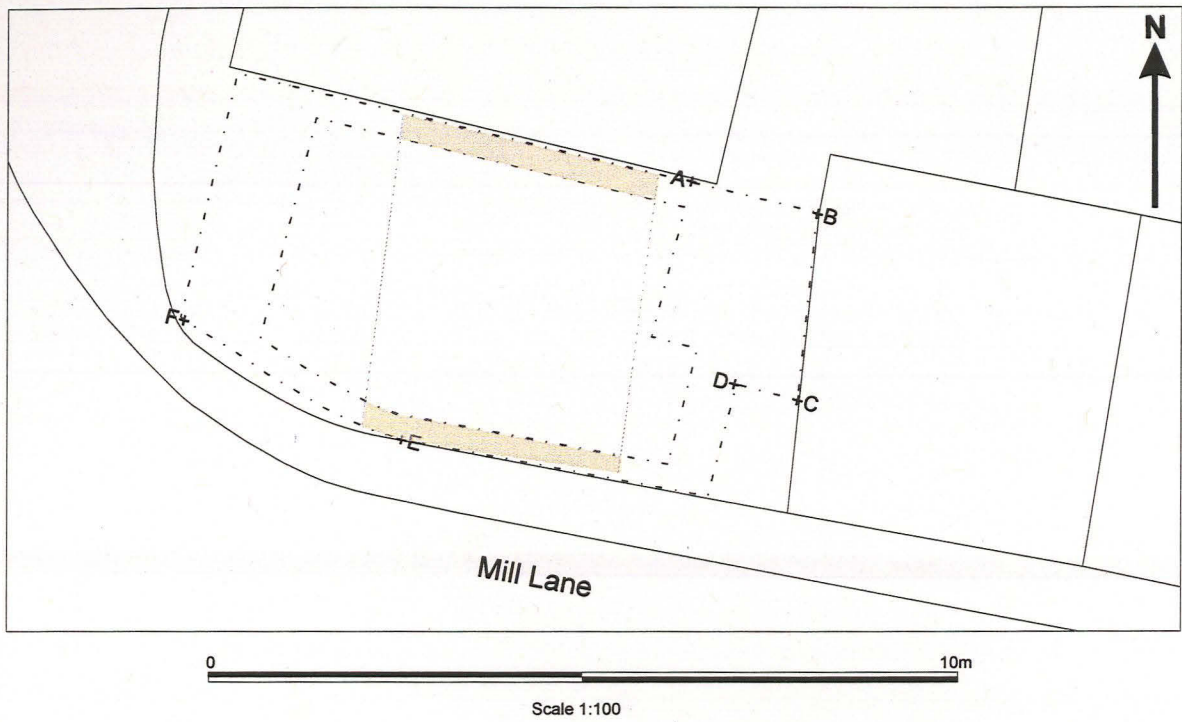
Plan of the foundation trenches at scale 1:100. Approximate extent of former cellar shaded grey
